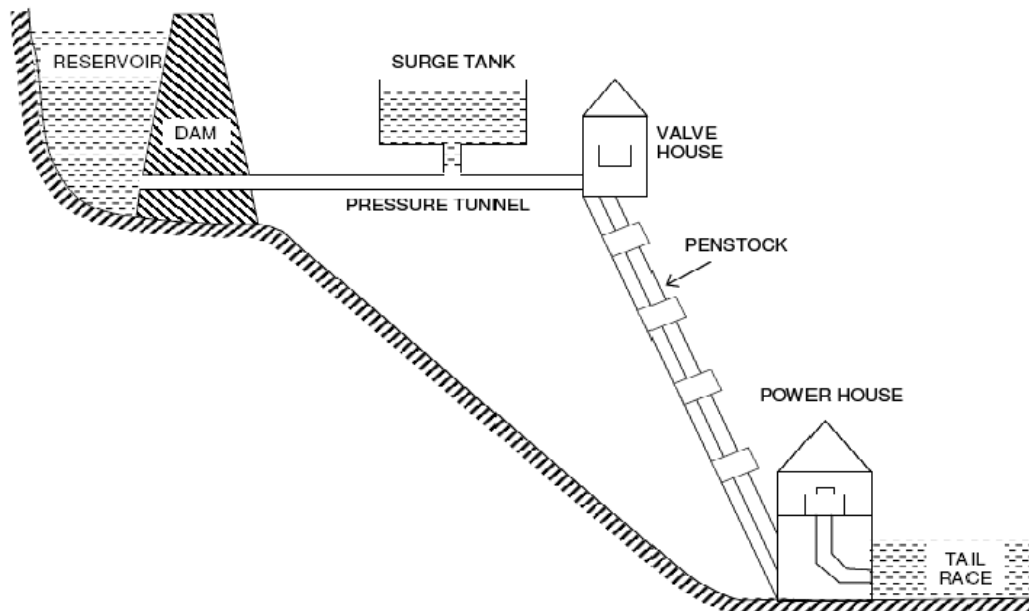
Typical layout for a storage type hydroelectric power plant.
